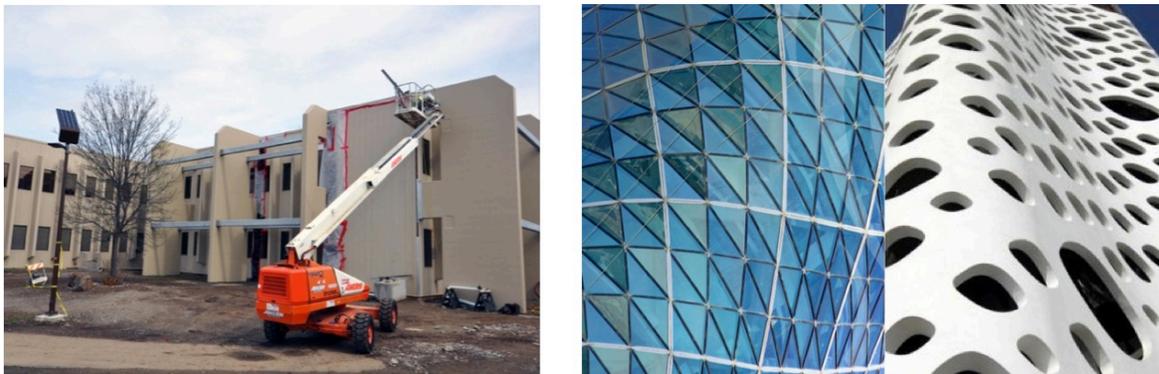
Additional shear walls built outside the perimeter of the existing building (left) (from: <http://crf.sandia.gov/crf-seismic-retrofit-complete/>); examples of shell structures, which could be further conceived to serve as anti-seismic retrofit structures (right): steel shell (Capital Gate, Abu Dhabi), reinforced concrete shell (O-14 Dubai Tower).
